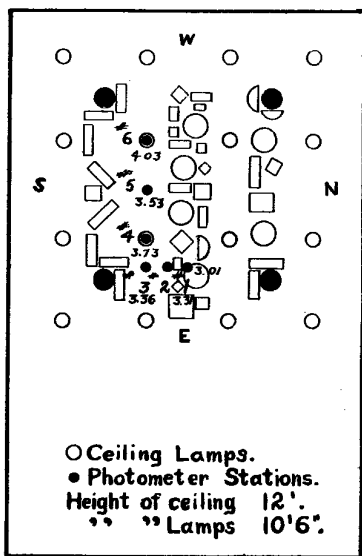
Section plan of seventh floor, (furniture department), showing location of furniture, pillars, lighting units, test stations and illumination data.
